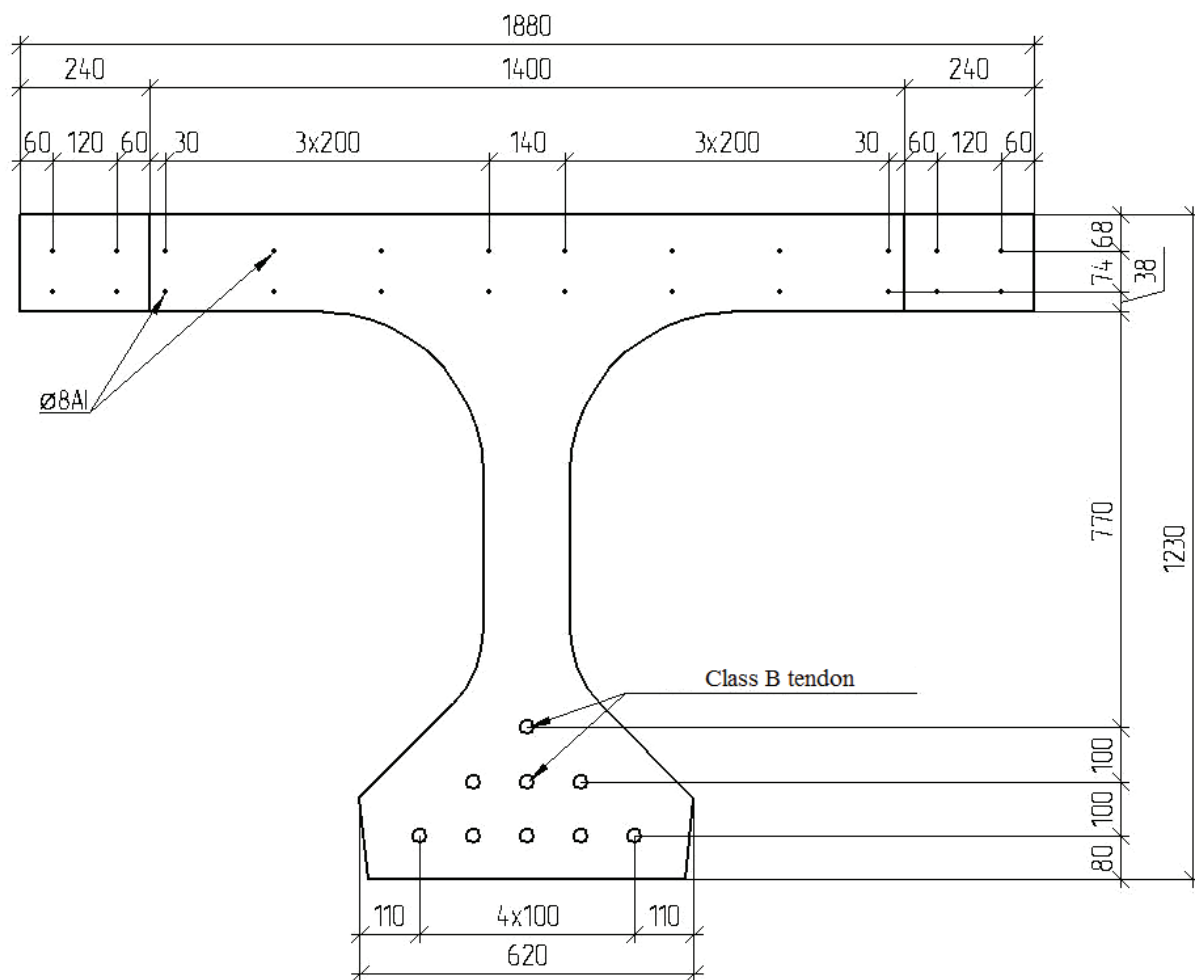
Sizes and reinforcement of a section of a ferroconcrete beam
